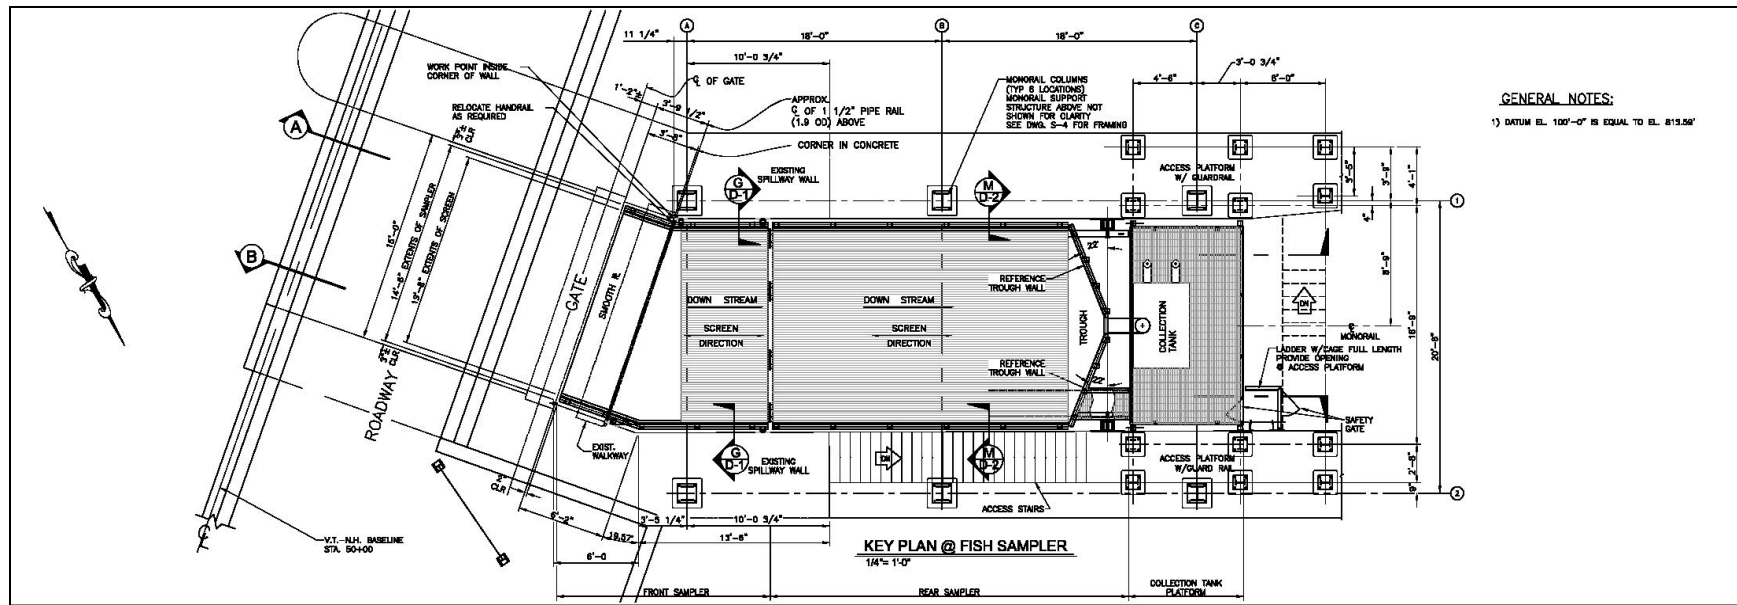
Key plan of TransCanada's Moore Development inclined plane sampler. The plan does not show flow reflectors installed after the fish trap was erected. Plan drawing prepared by Kleinschmidt.
